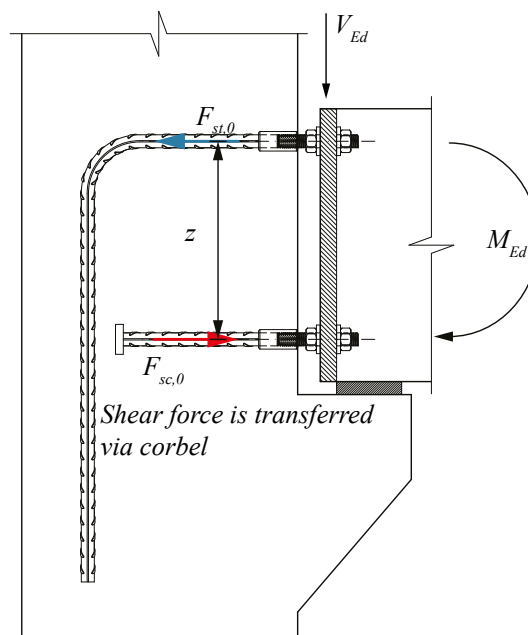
Structural behavior of anchoring couplers in beam-to-column connection.
